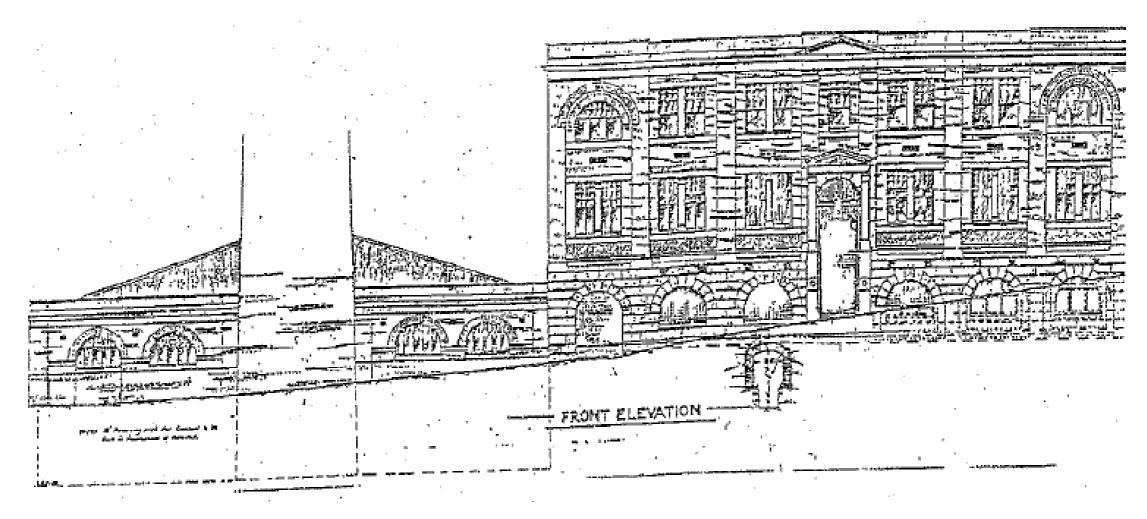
Image showing the north elevation of the office building and the old boiler house prior to the William Henry bridge extension (Source: NSWGT Contract No.12 Drawing No. 4 1898 in Architectural Projects 2003 p. 68)
